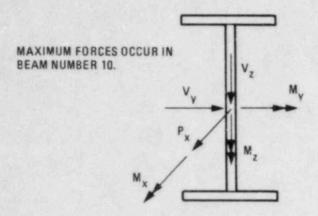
STRUCTURAL STEEL FINITE ELEMENT MODEL (Sheet 4 of 4)
